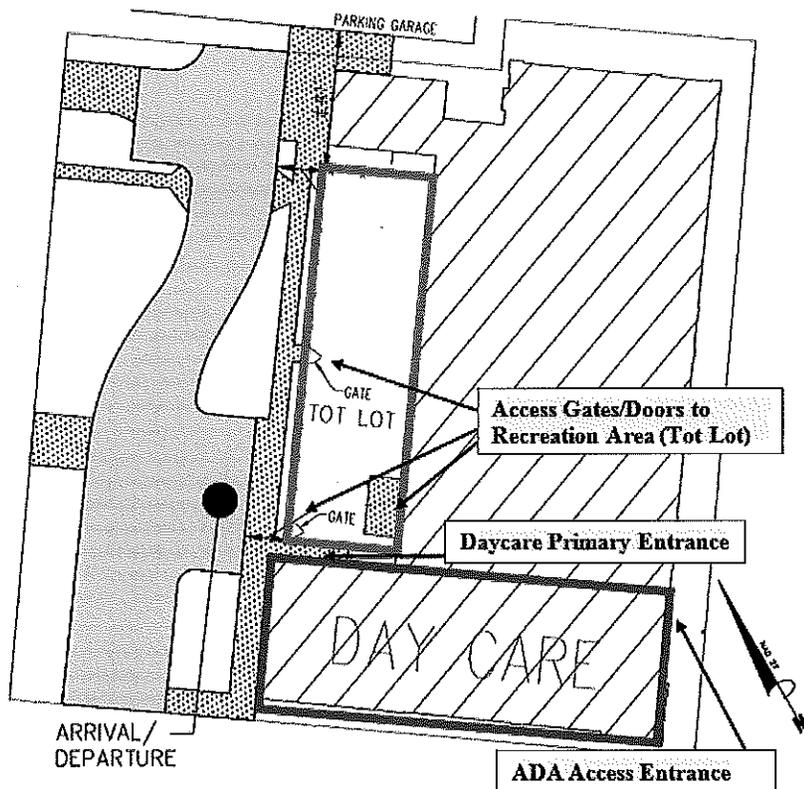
Building M Proposed Daycare and Recreation Area Layout
